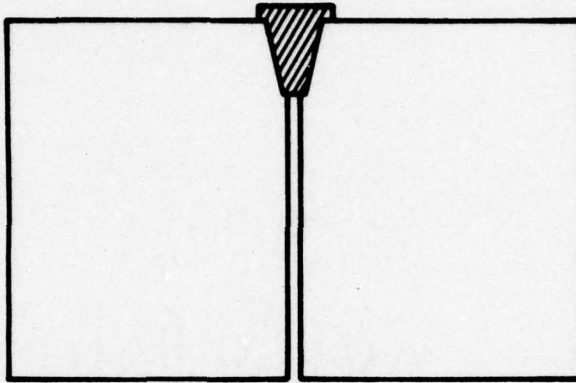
Test #3--Symmetric loading with single conical anchor
